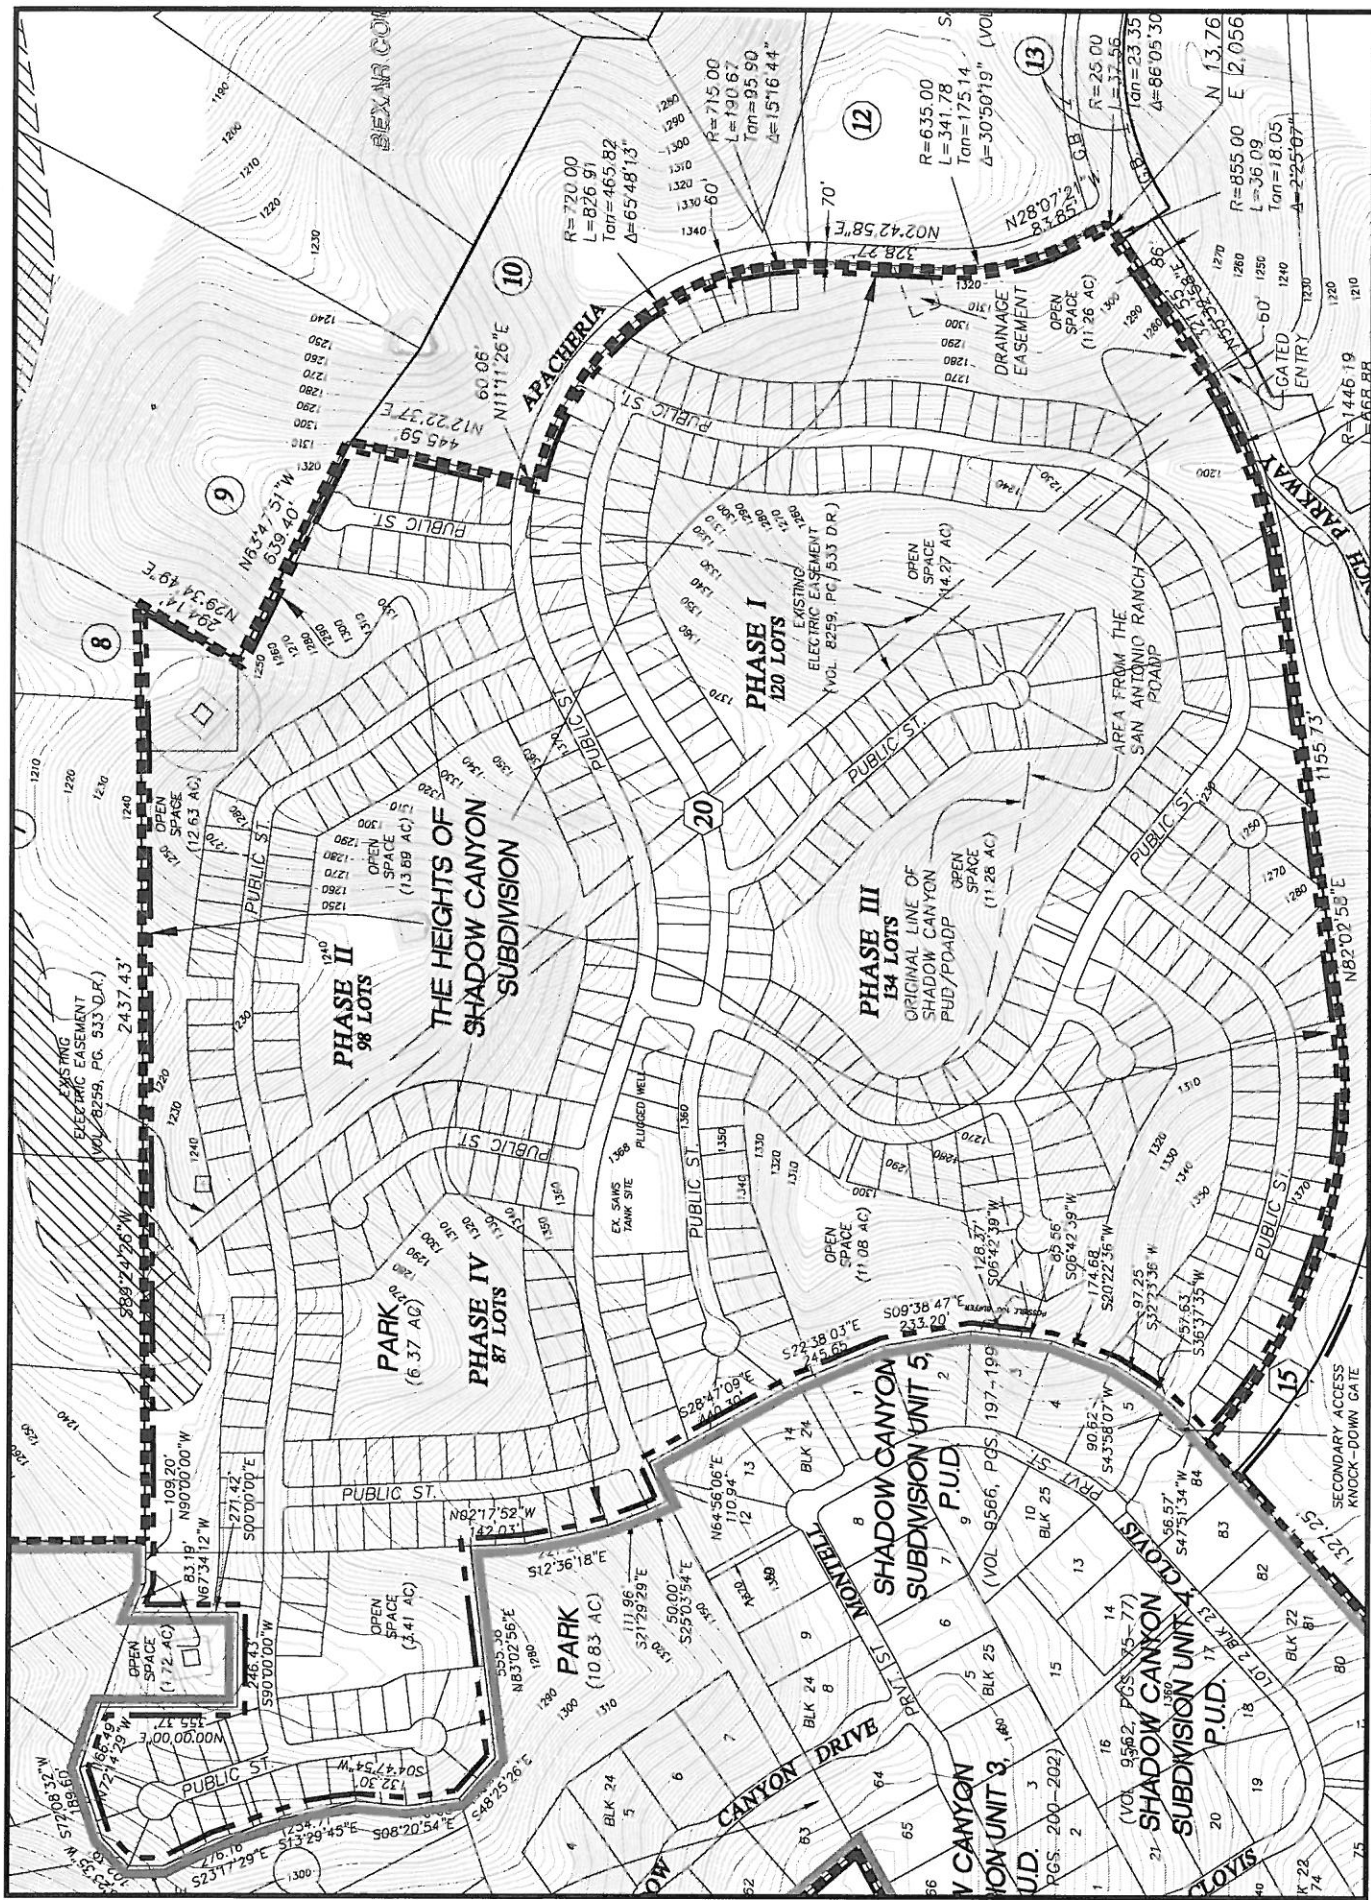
Subdivision plan for the Heights of Shadow Canyon MDP.
